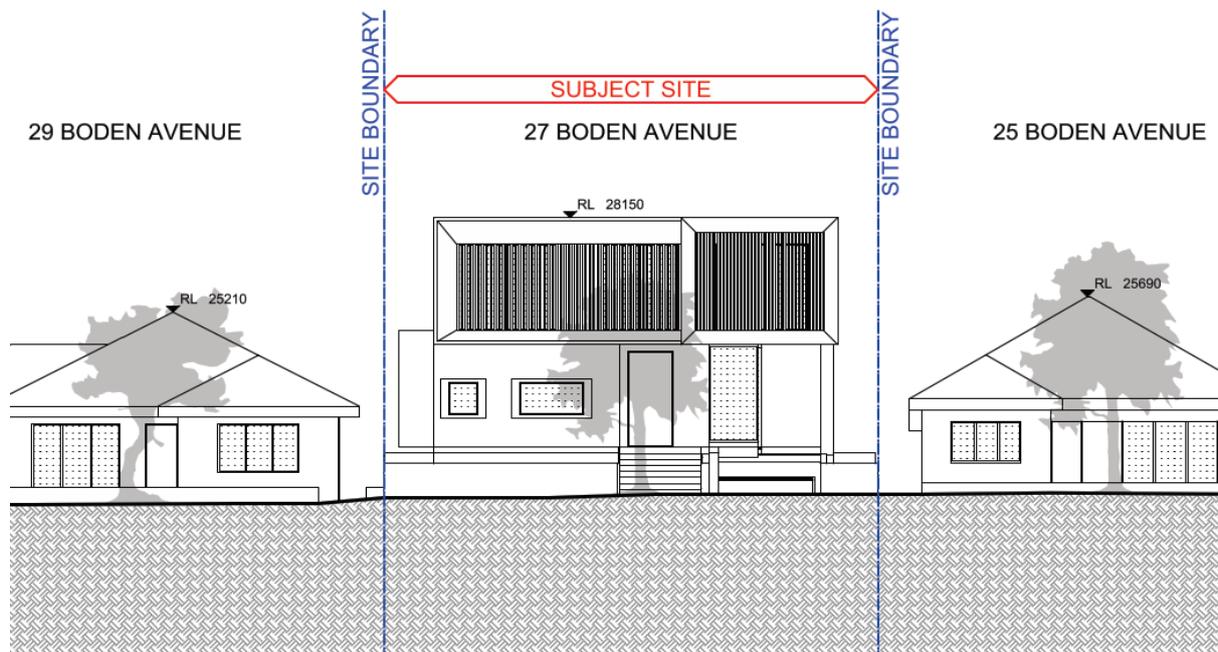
Extract of the streetscape elevation (source: AE Design Studio).
